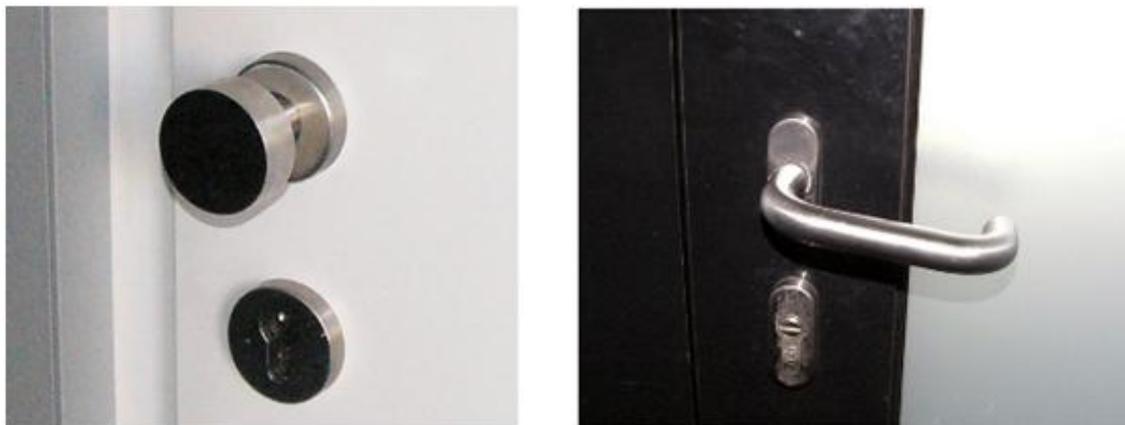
Examples of bad practice (left) and good practice (right): The photograph on the left shows an inaccessible, round door knob, while the photograph on the right shows an accessible, lever-style curved door handle that is easy to use without applying too much force, in high contrast to the background.
